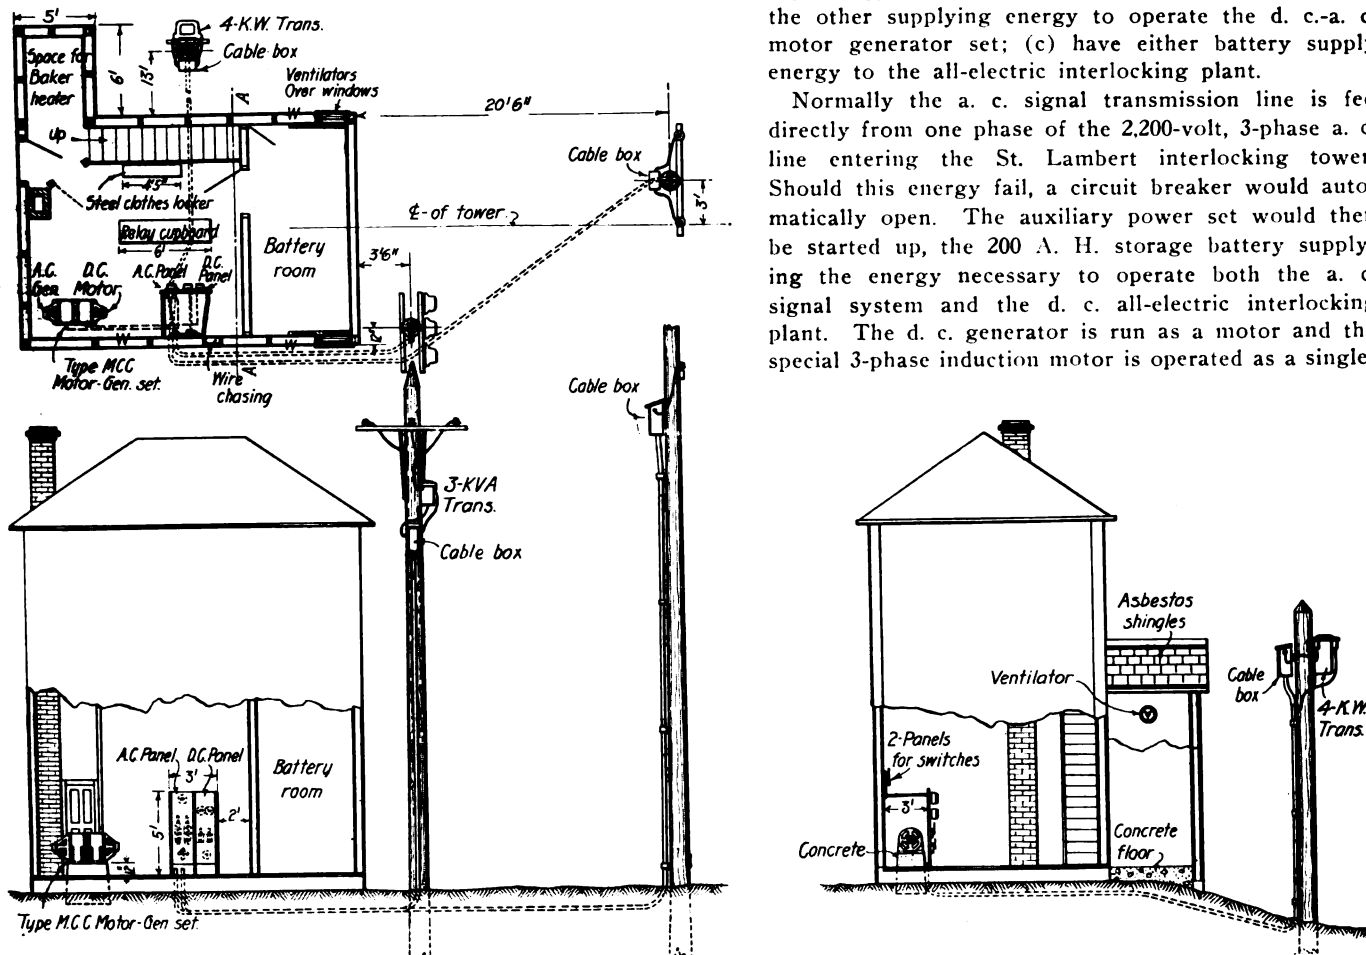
St. Lambert Interlocking Tower, showing Motor Generator Set Installation.
